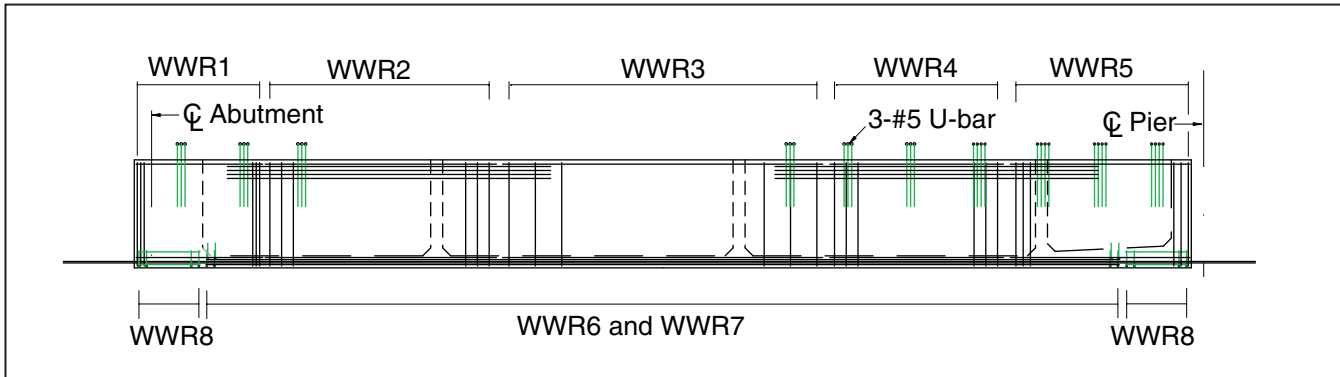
Concrete girder welded wire reinforcement (WWR). Note: No. 5 bar = 16M; # = No.
